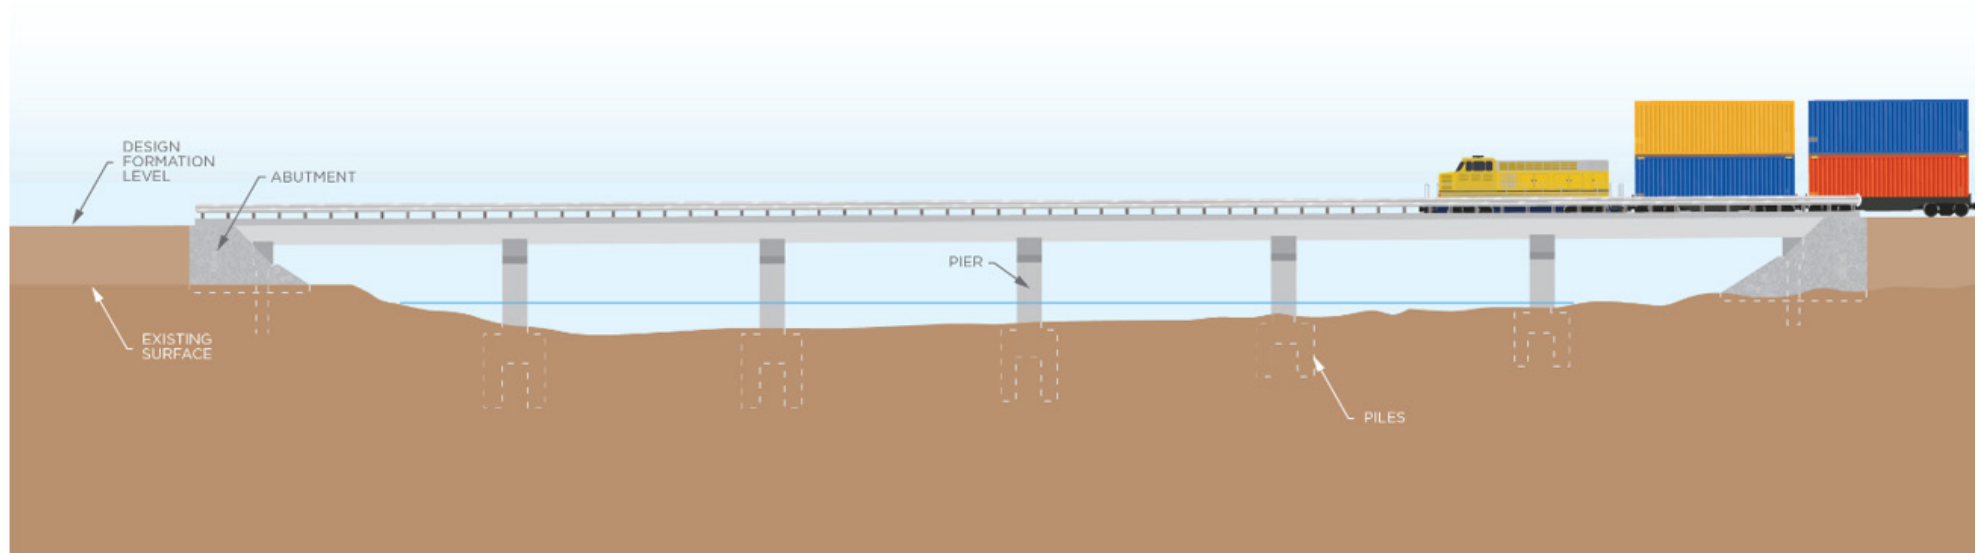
TYPICAL SECTION OF RAIL-OVER-WATERCOURSE BRIDGE STRUCTURE
